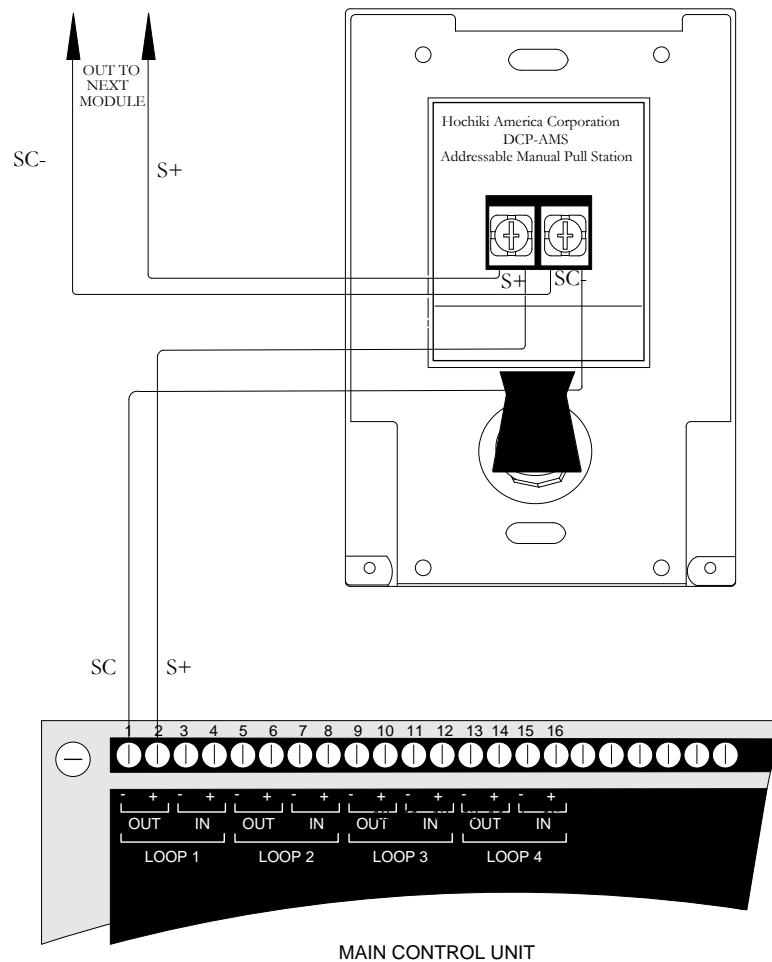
AMS Addressable Manual Pull Station Wiring Detail
